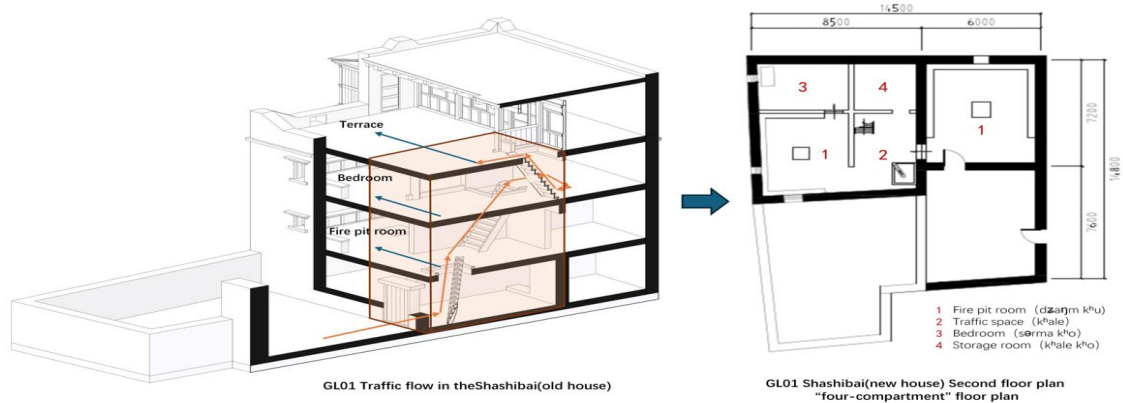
Traffic Flow and Intermediate Floor Plan of a Traditional Galan Diao House
